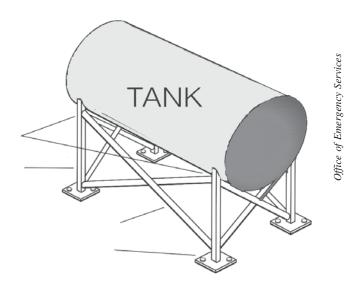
Bracing tanks. Tank supports should be cross-braced as well as bolted to the floor.
